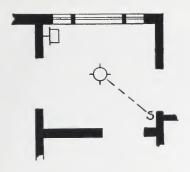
A well shaded candelabra luminaire with wall brackets to match give this dining room good lighting on the table top in addition to broadcasting light throughout the entire room.
